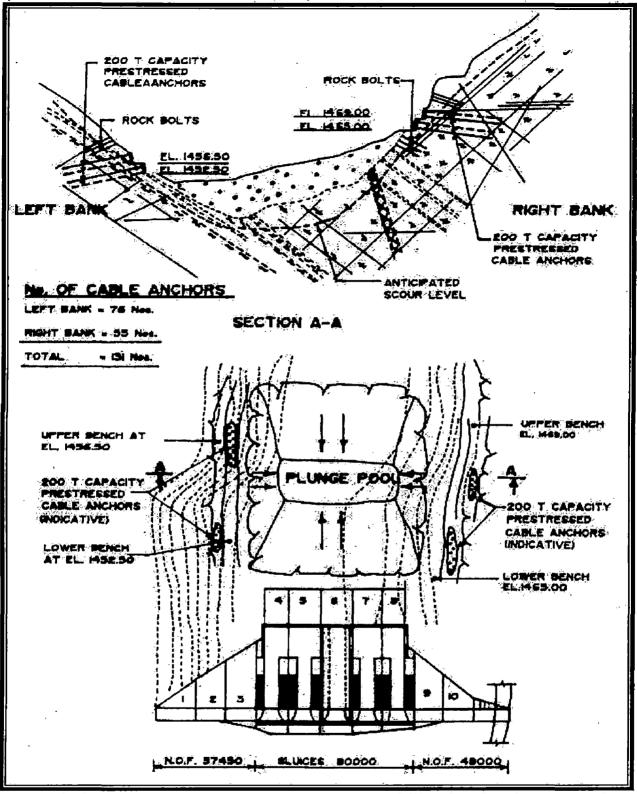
Schematic sketch showing slope stabilization in plunge pool area
